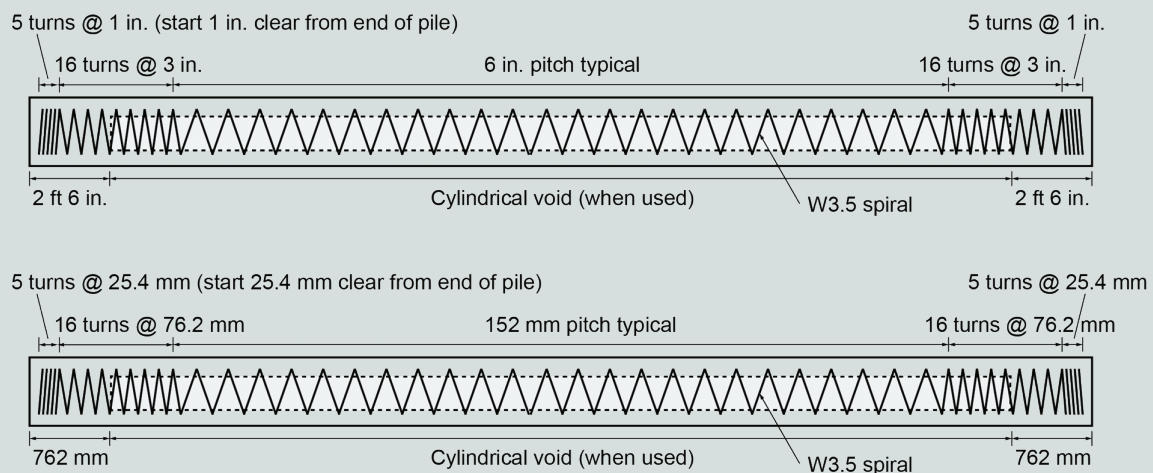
Spiral transverse reinforcement for piles 24 in. (610 mm) or less in width or diameter.
